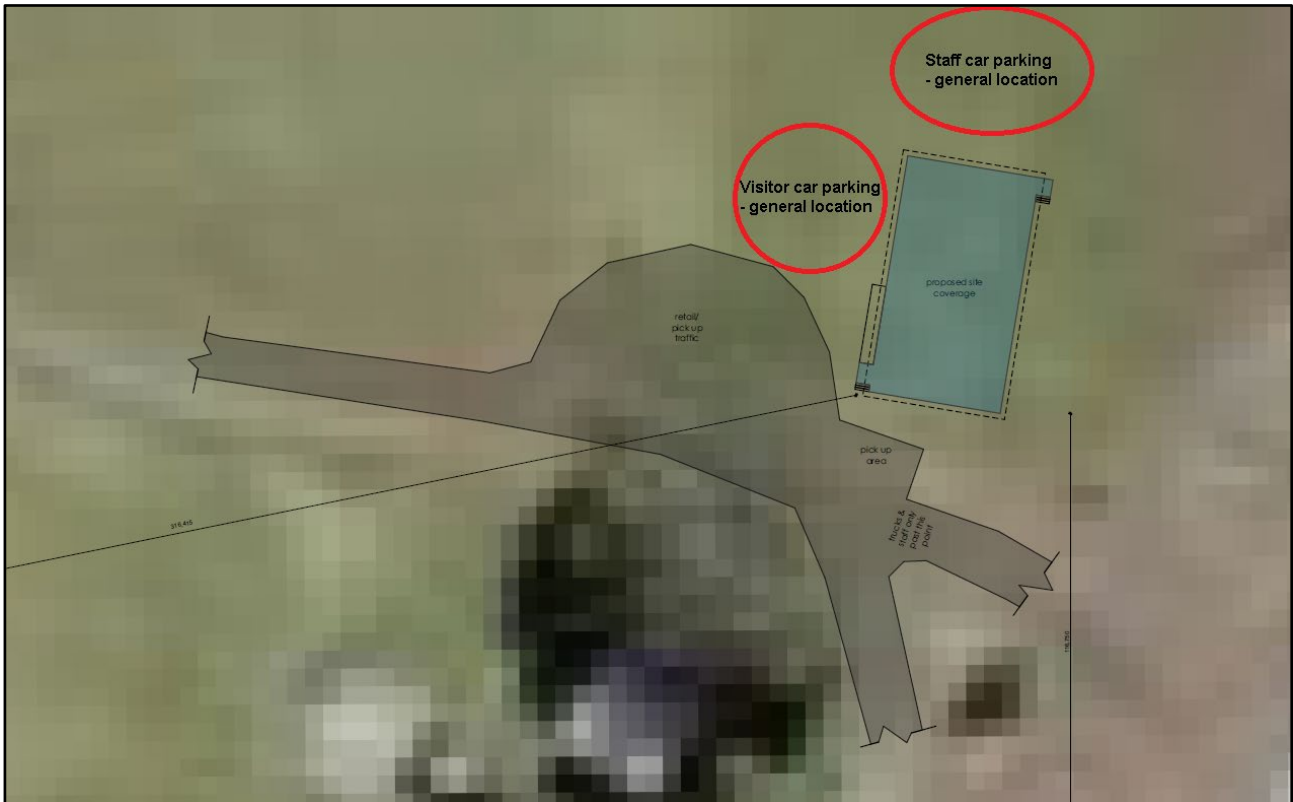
Car parking general locations – Extract from Site Plan by Cyber Drafting & Design
